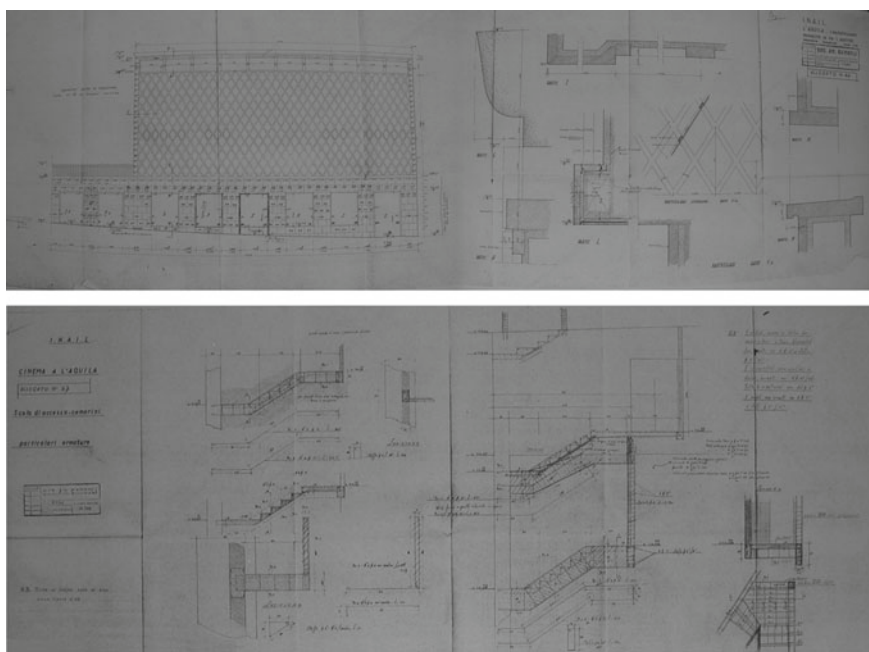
Original project drawings of Cinema Massimo in L'Aquila: Carpentry and executive façade with constructive details
